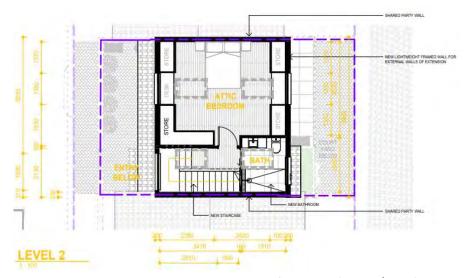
Originally proposed second storey floor plan (DA-15/2022)
